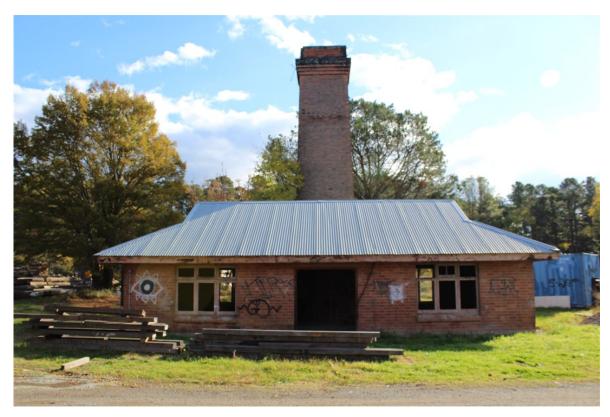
East elevation of Fan House with Chimney Stack behind. (Source: GML, 2017)
